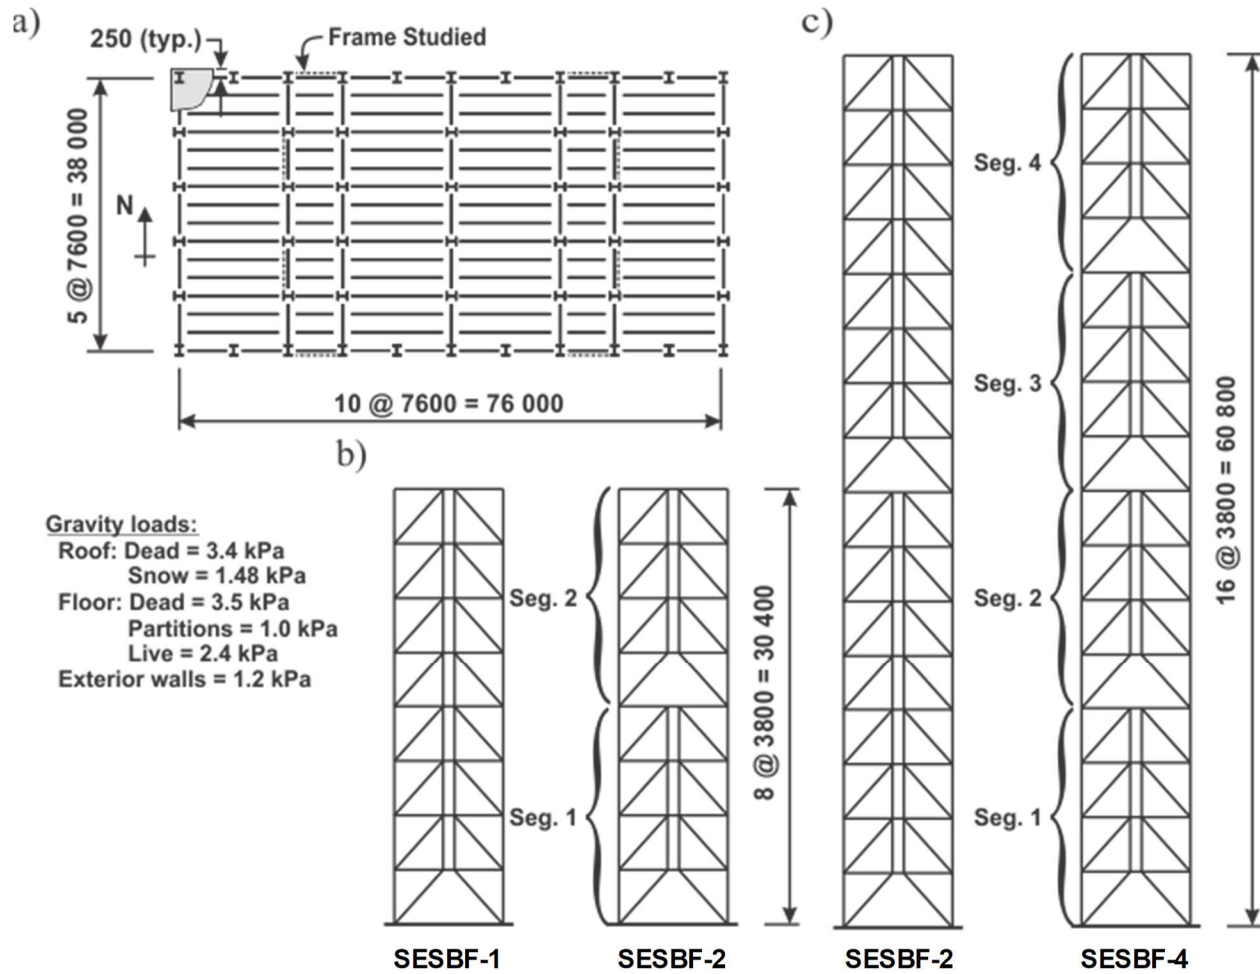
Building studied: a) Plan view; b) Elevation of 8-storey configurations SESBF-1 and SESBF-2; and c) Elevation of 16-storey configurations SESBF-2 and SESBF-4.
